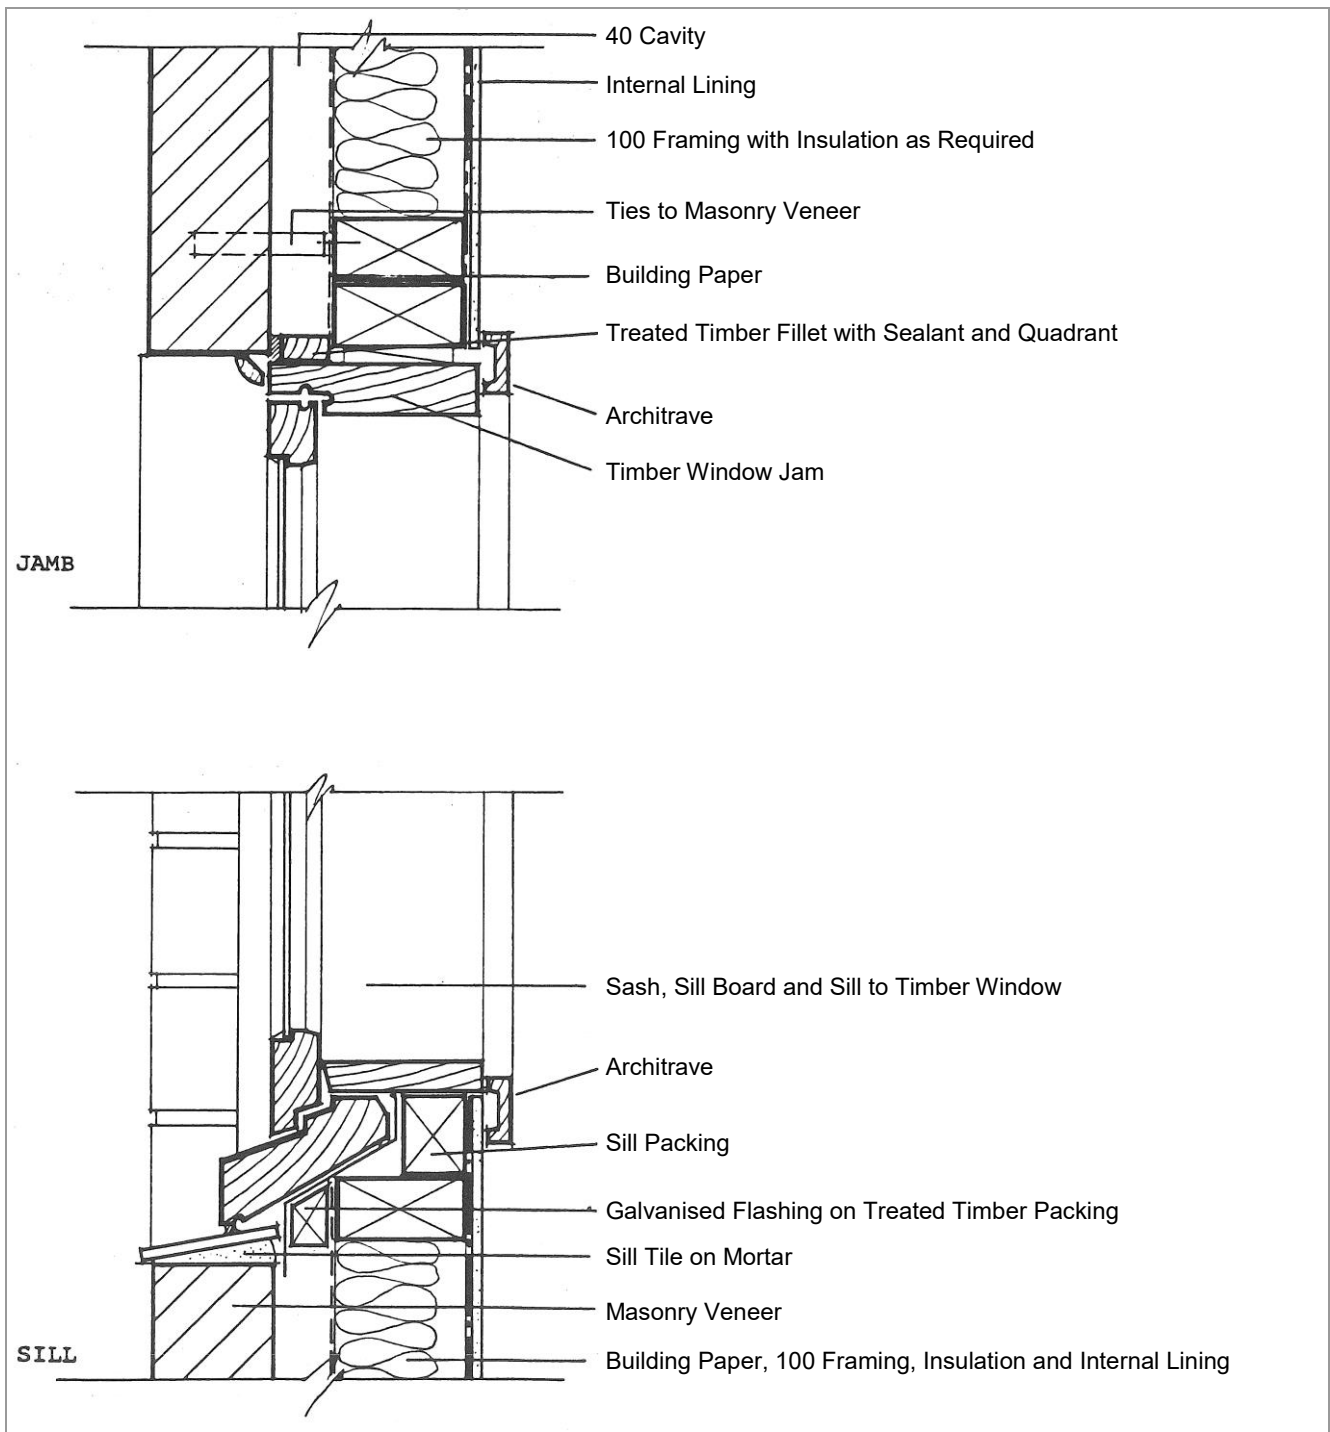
Jamb and Sill Details – Traditional Timber Windows
